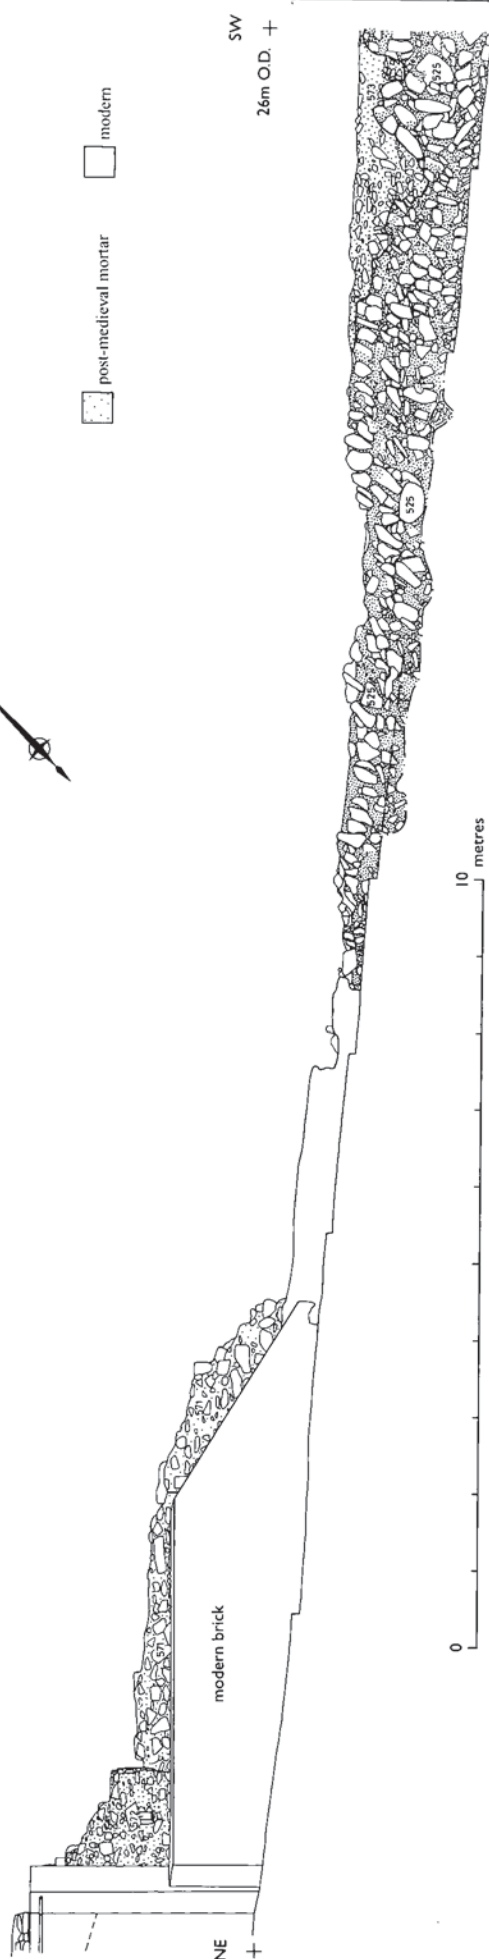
Western Way-Watergate plan, internal elevation C. Scale 1:100.
